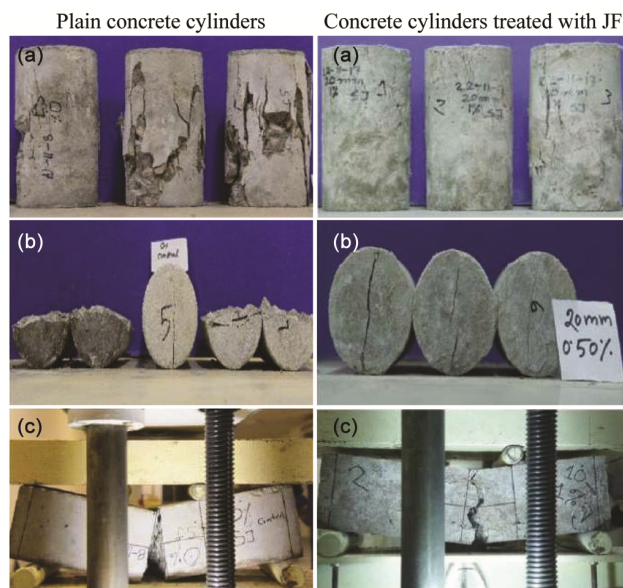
Failure pattern of the concrete cylinders observed under (a) compressive strength test (b) split tensile test (c) flexural tensile test<sup>65</sup>
